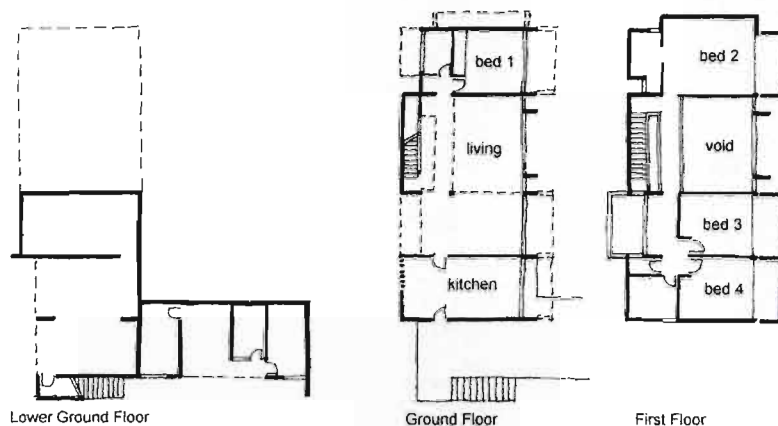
B.Lee - House Randeria 1966. Plans.
